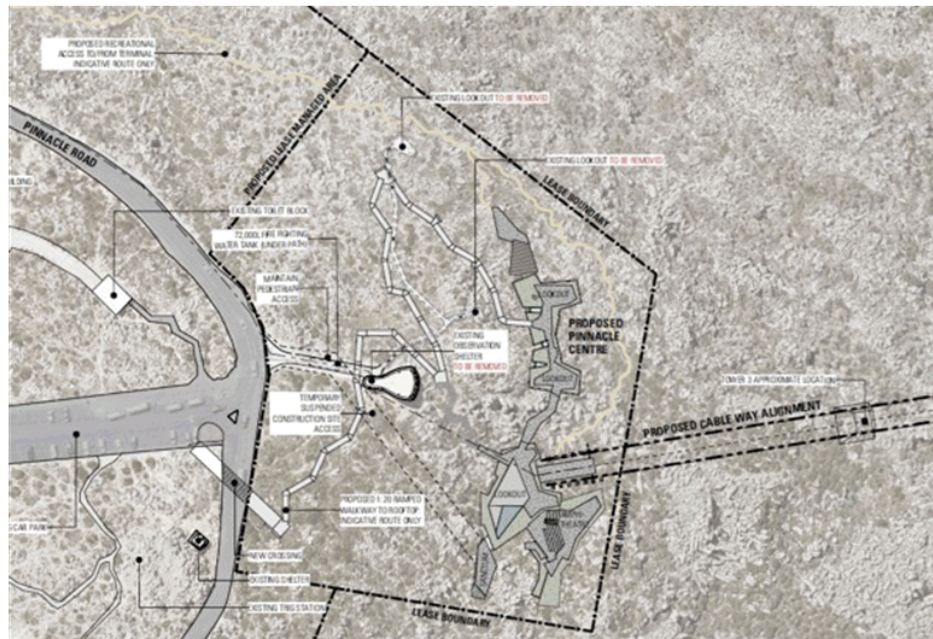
Pinnacle Centre site plan (source: JAWS Architects)
